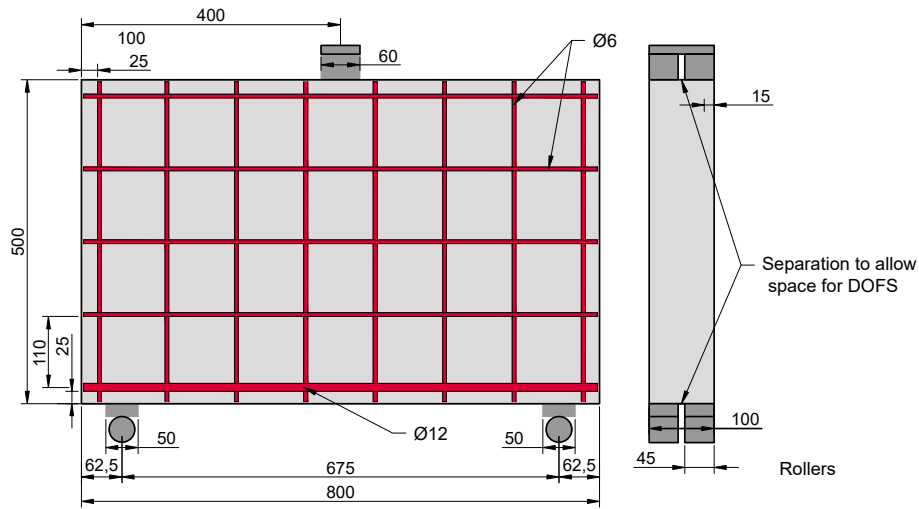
Geometrical description of the concrete wall, steel reinforcement arrangement, supports and loading plate (units in mm).
